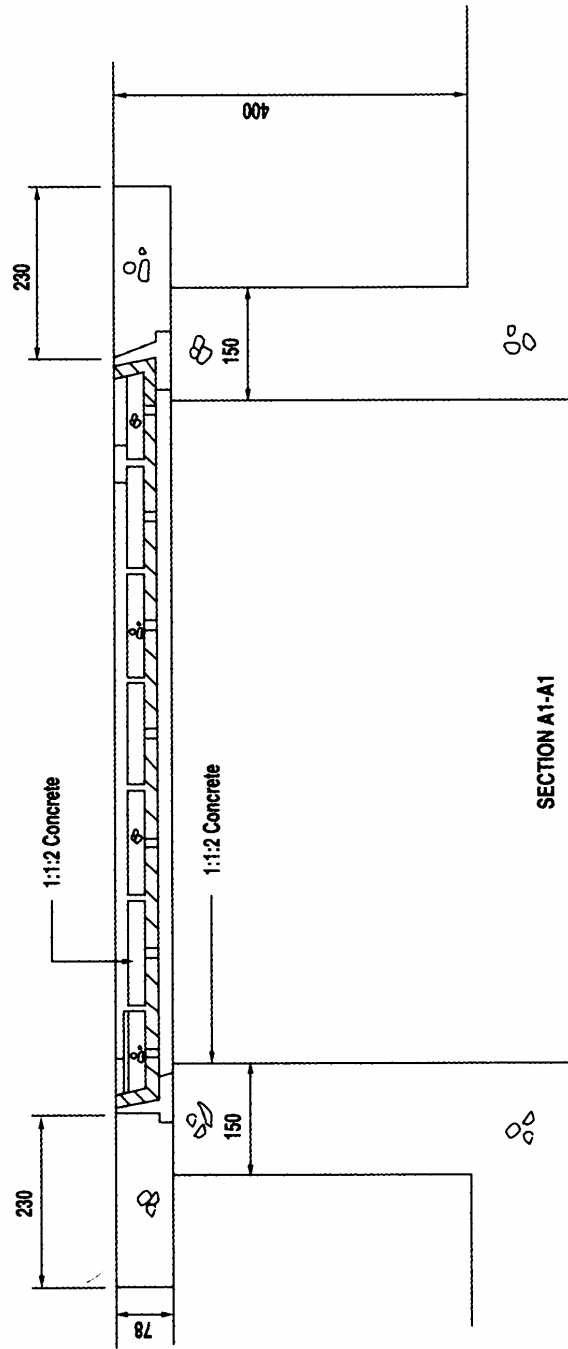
MANHOLE DRAWINGS - TYPE MX2
